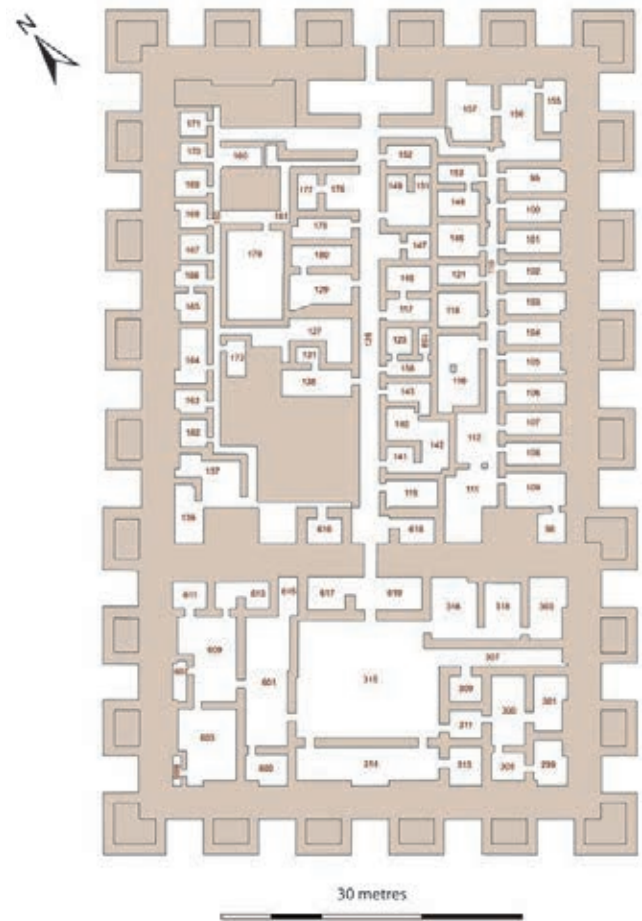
Plan altered for use in space syntax analysis, with additional walls and doorways hypothesized and areas where the division of space is unknown discounted.
